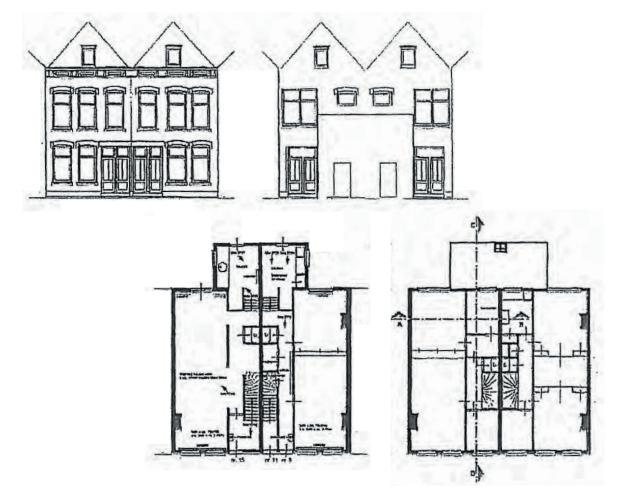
Front and rear facade (top) and plan first and second floor (bottom) (TM, 2011).
